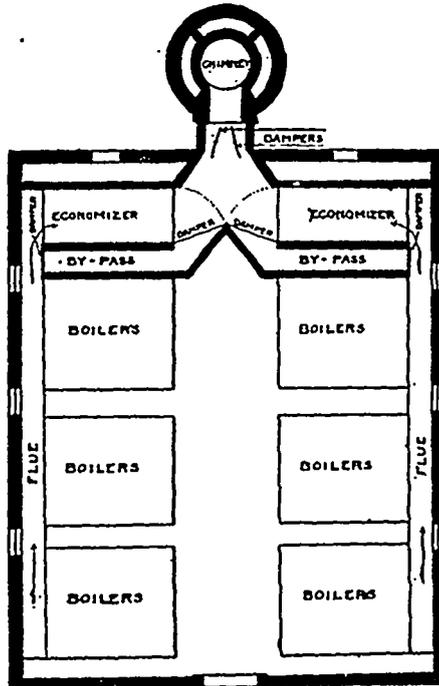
2400 H.P., BOILER PLANT EQUIPPED WITH CHIMNEY DRAFT.
